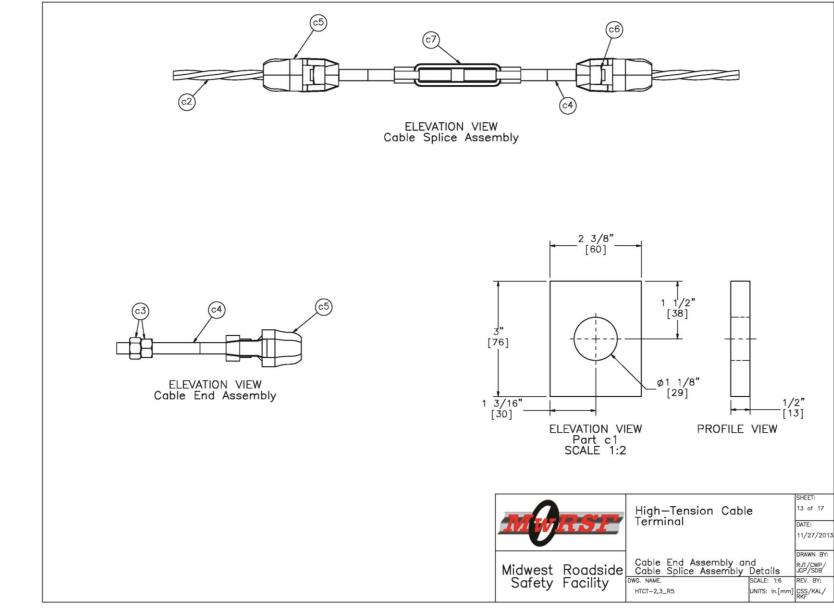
Cable End Assembly and Cable Splice Assembly Details, Test Nos. HTCT-2 and HTCT-3
